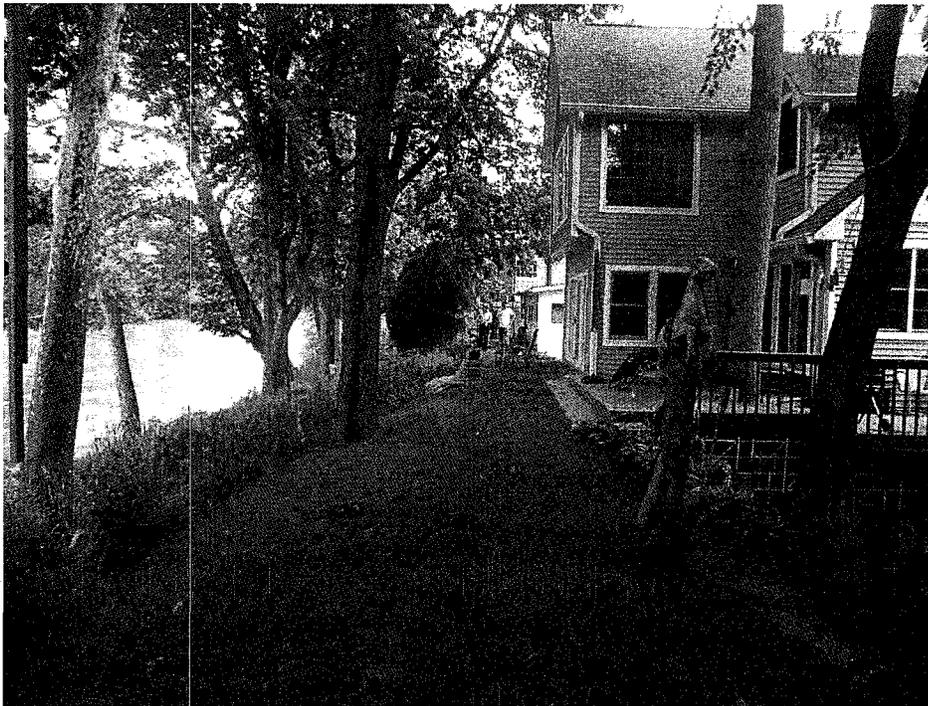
Riverward slope of levee and crest looking north (Station 28+00)
